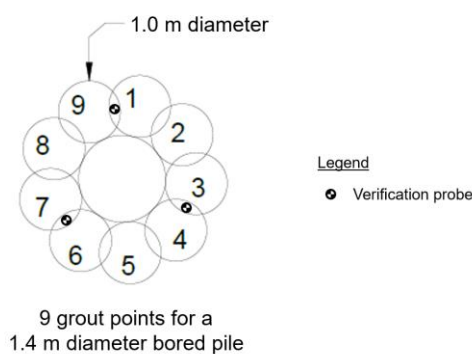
An example of the grouting layout and location of the verification probes for the multiple-point grouting method for a 1.4 m diameter bored pile
